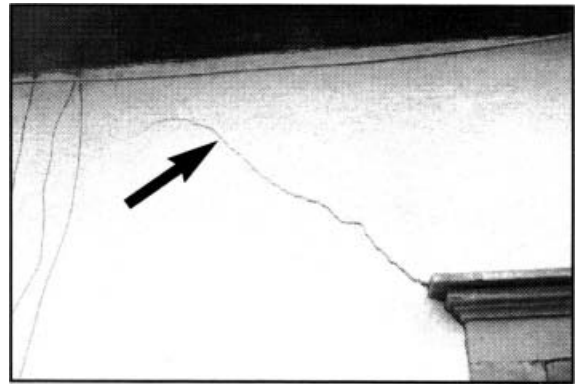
Crack at a window opening on the west wall above the area shown in Figure 10.9. The window is just north of the central doorway. The crack tapers in width indicating slumping of the wall below.
